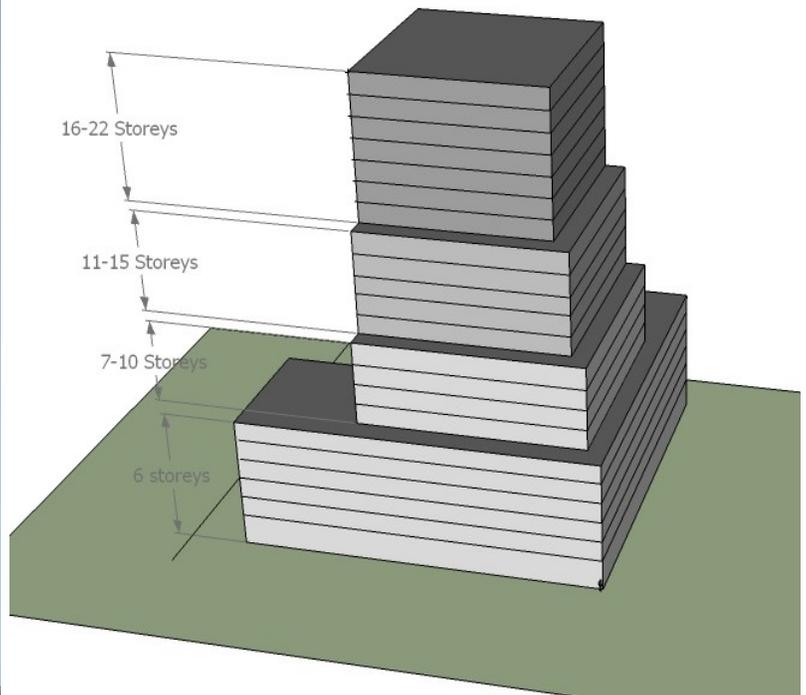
Combination of building floor plates and heights may be permitted subject to other development criteria being met
